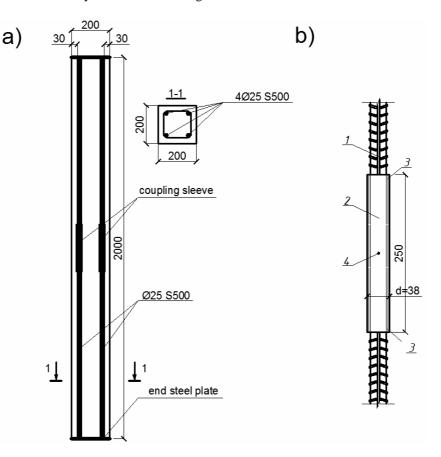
a) Scheme of longitudinal reinforcement samples columns; b) construction coupler connection reinforcement bars:
